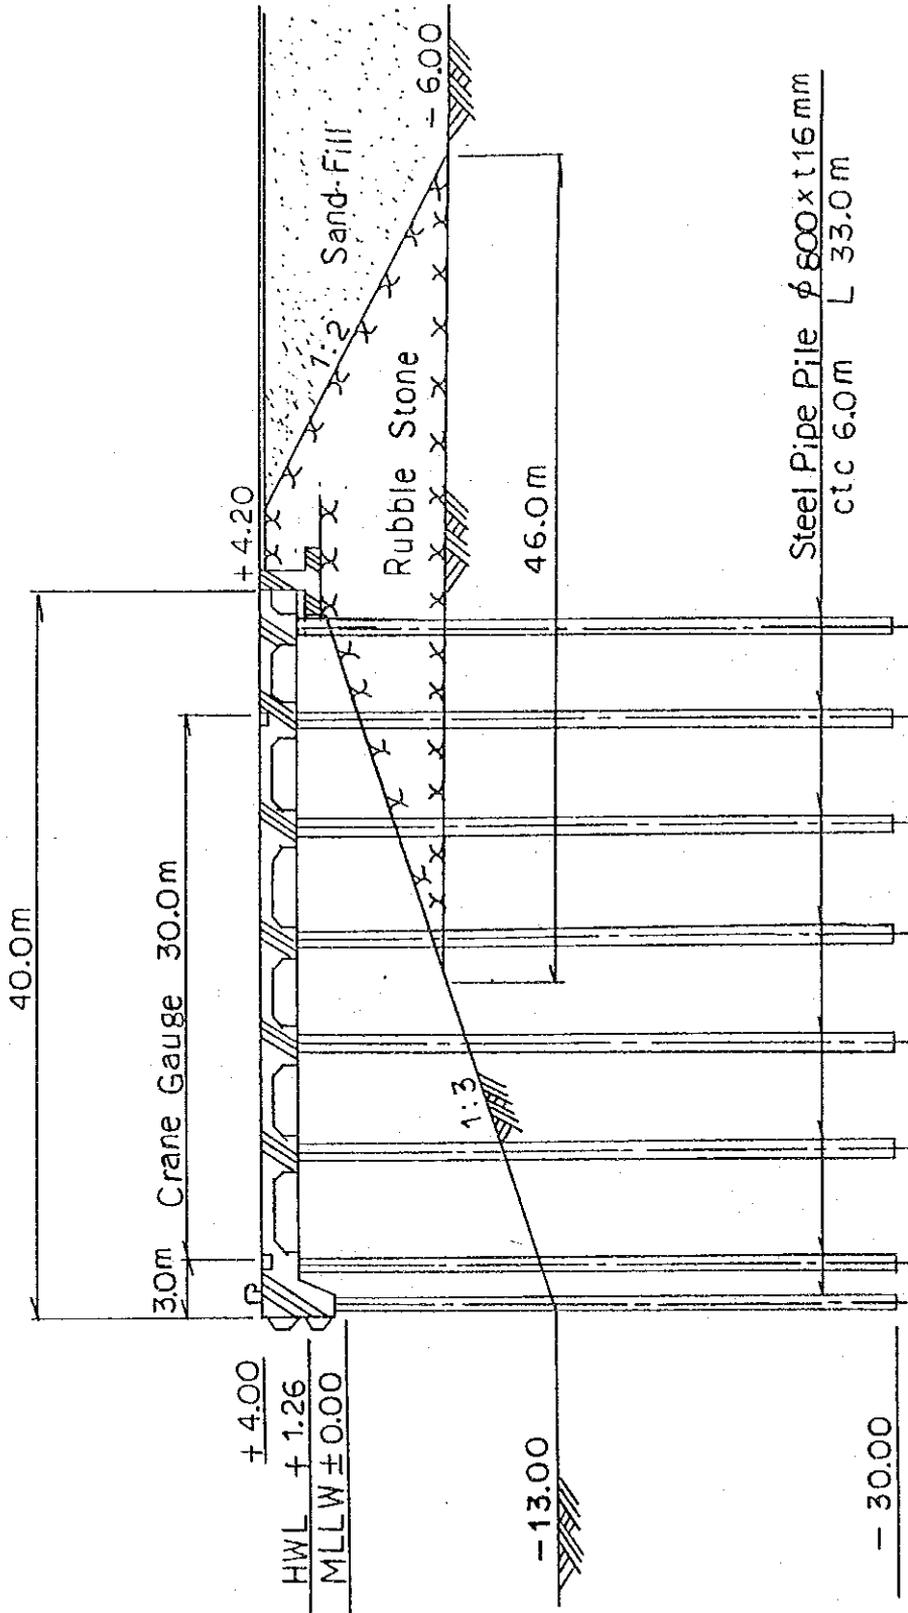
Typical Cross Section of -10m Container Berth at Sangley Point
